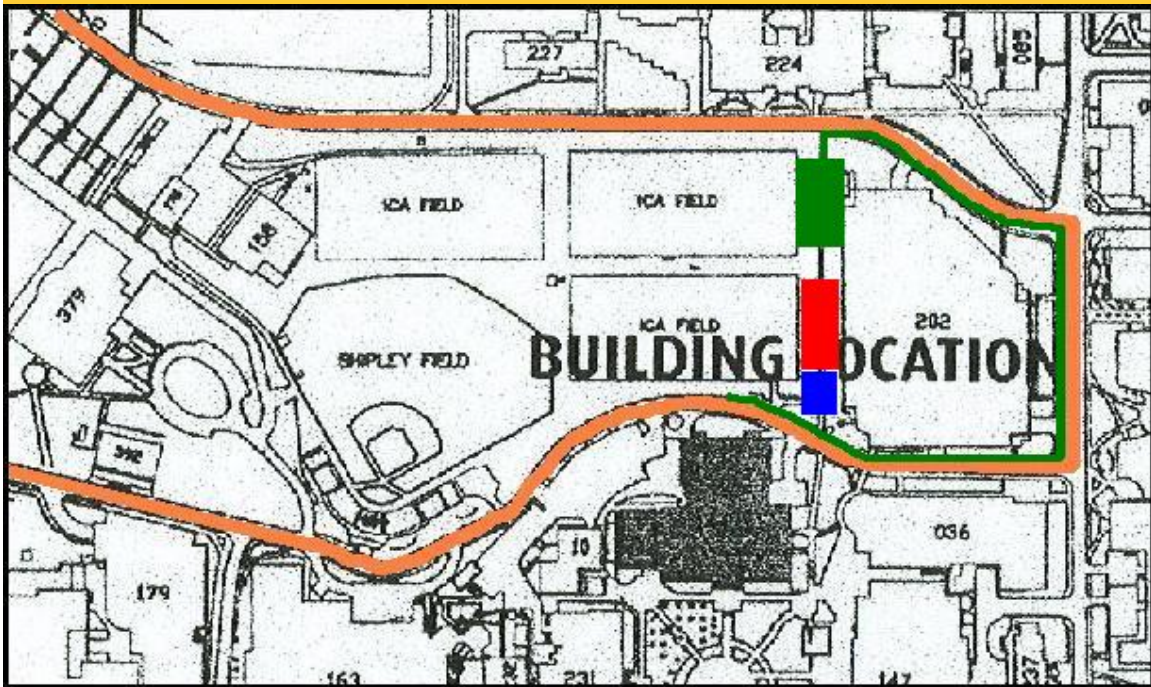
Proposed Truck Hauling Diagram (shown with trailers and material storage)
